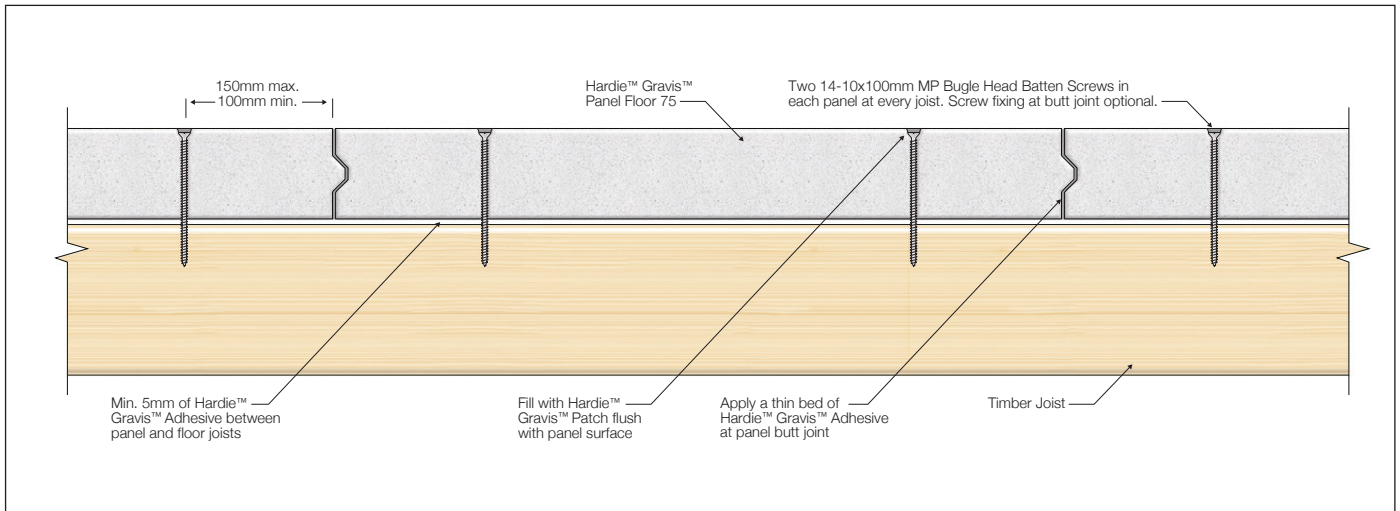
HARDIE™ GRAVIS™ PANEL FLOOR 75 FIXING DETAIL
